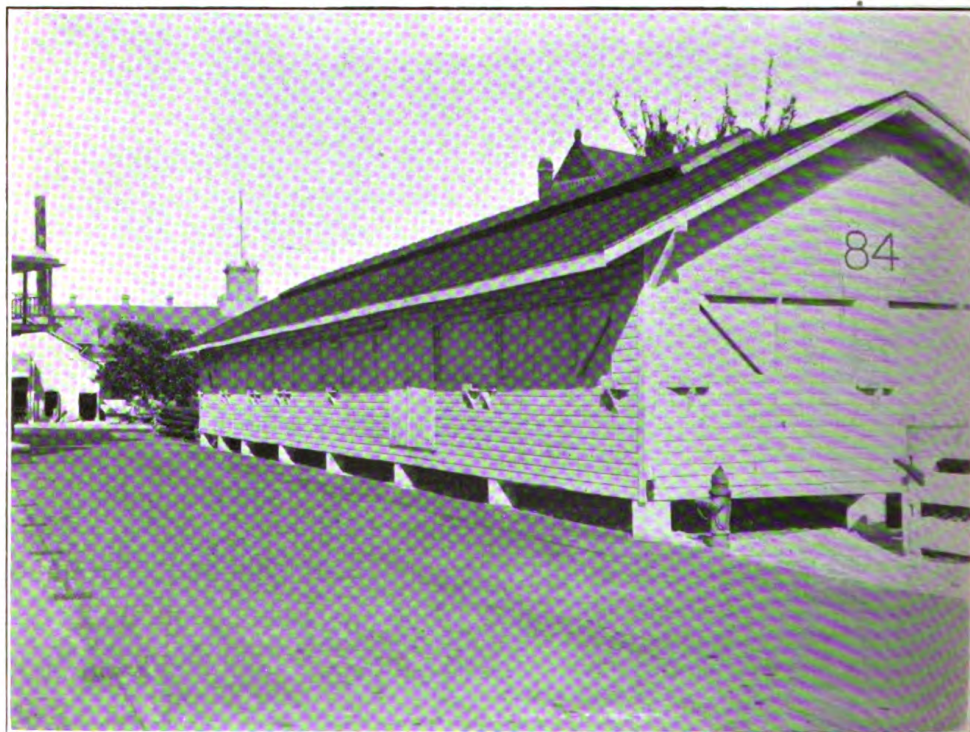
Building of type shown in Fig. 5, raised 18 inches off ground on concrete blocks.
